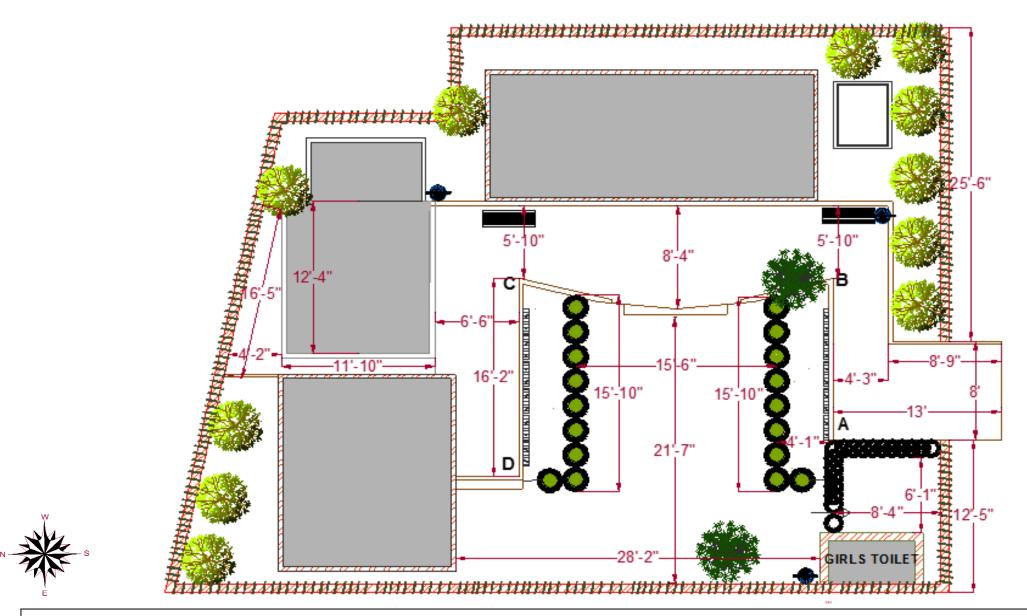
WORKING DRAWING OF PROPOSE LANDSCAPE AND PATHWAY DESIGN OPTION-I
